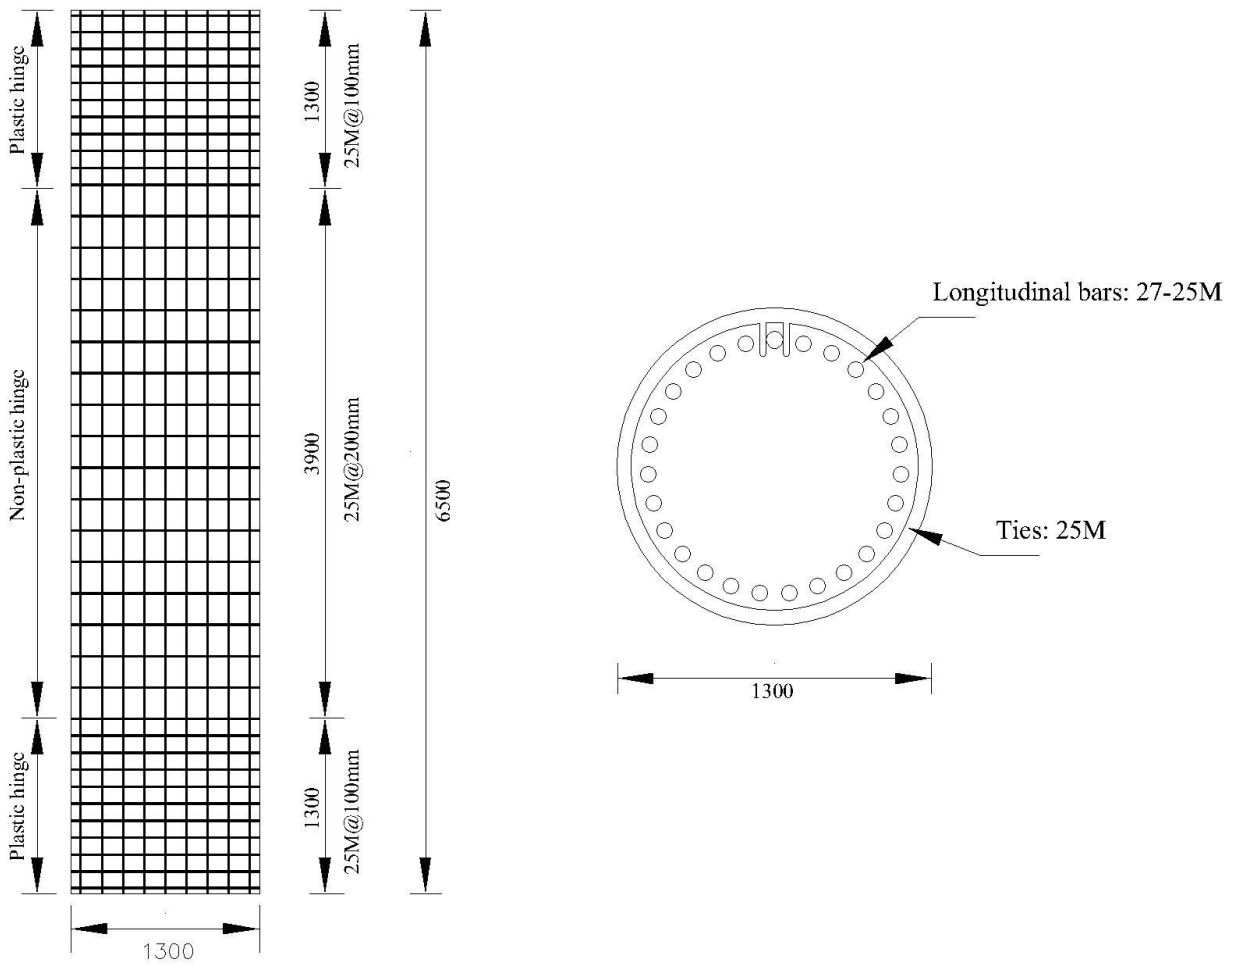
Reinforcement details for the Vancouver tied column (units: mm).
